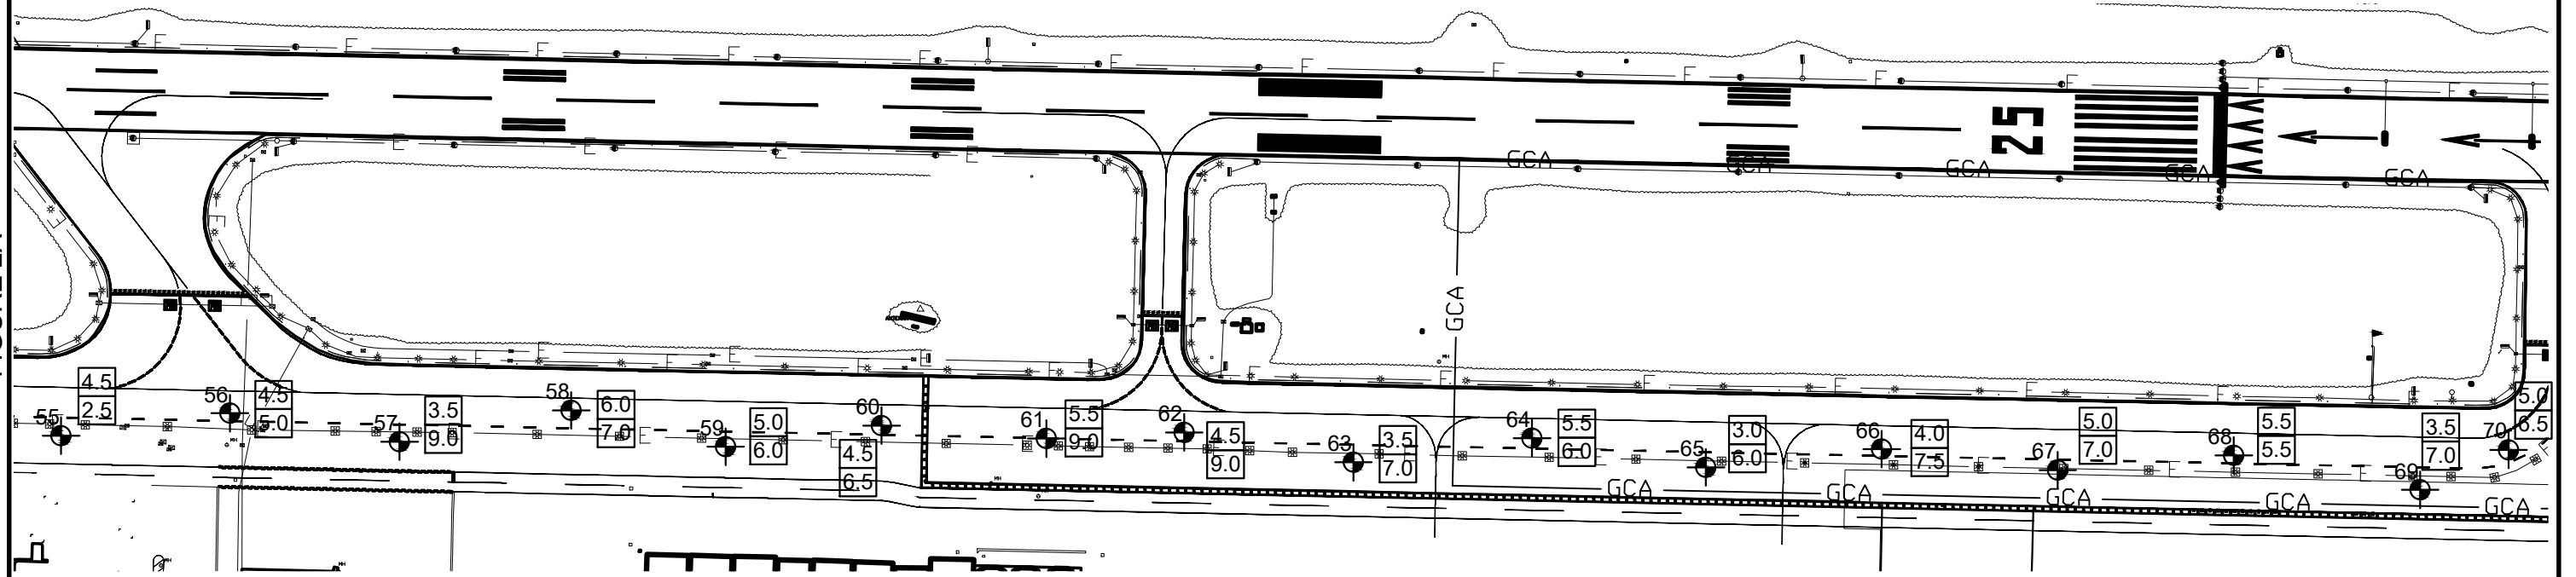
A - EXISTING PAVEMENT SECTION THICKNESSES
